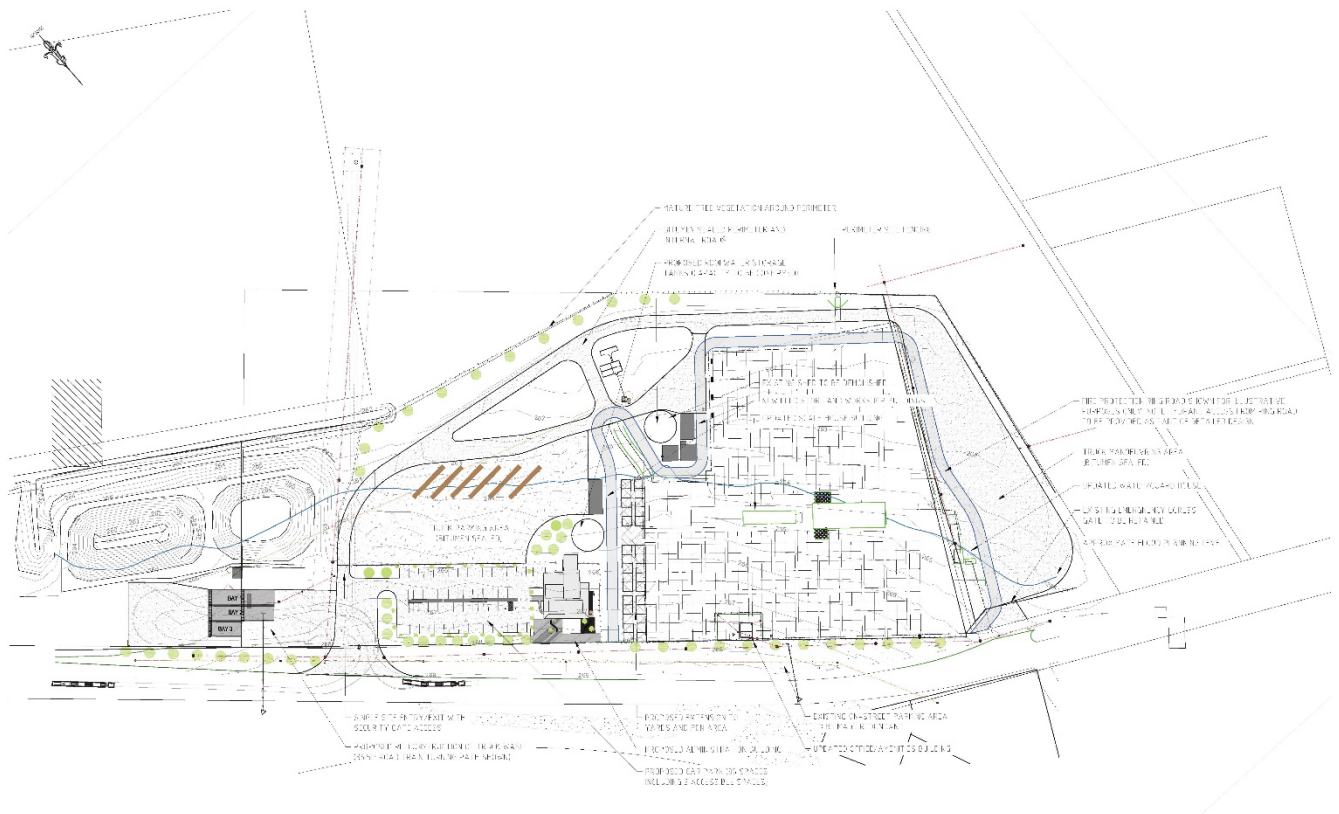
Site Plan of the Proposed Re-development (Kelley Cove)
